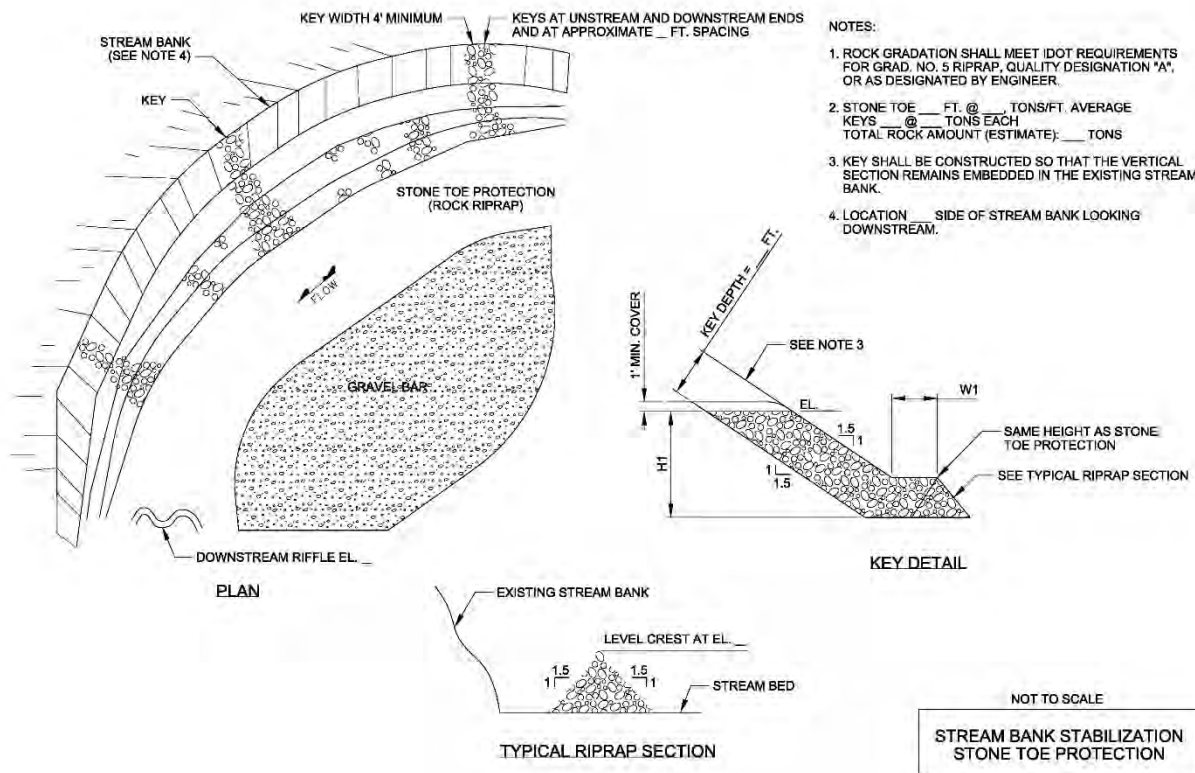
Typical Longitudinal Peaked Stone Toe Protection (LPSTP) Plans
